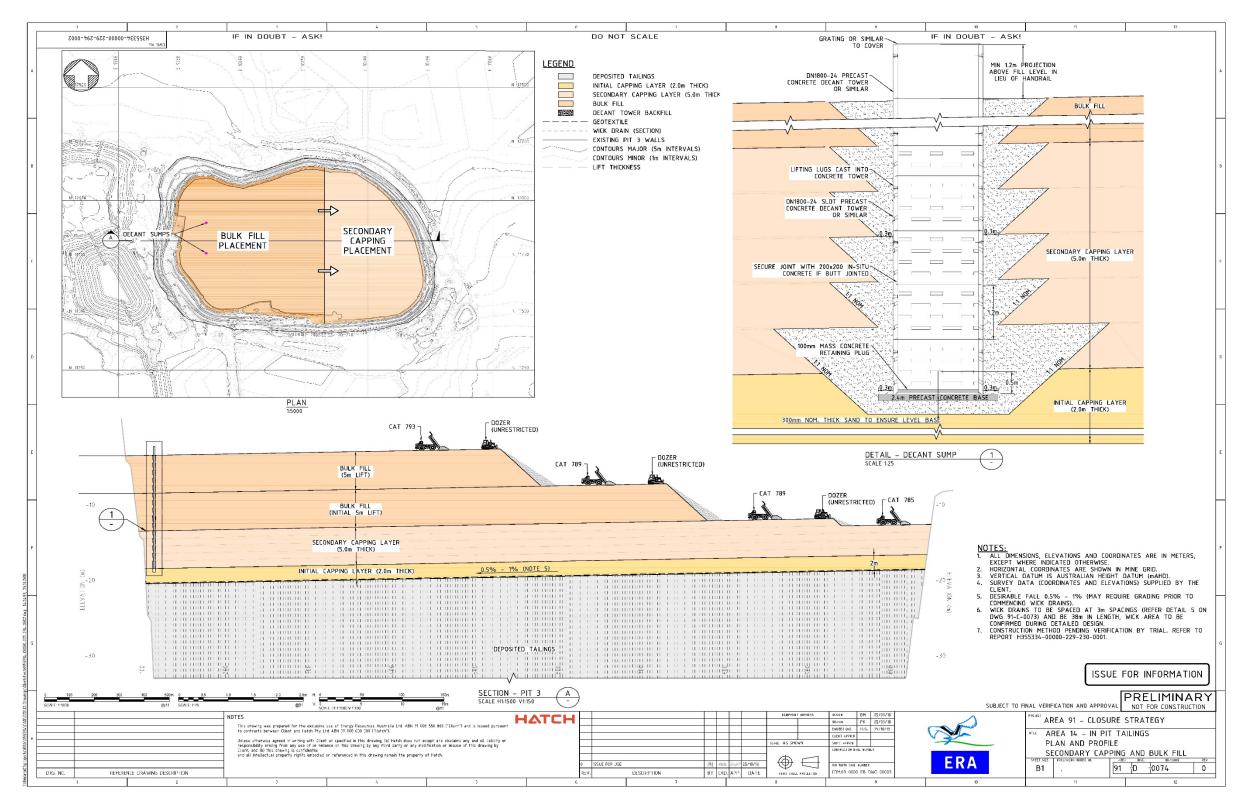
Pit 3 Secondary capping, decant wells and bulk fill plan
